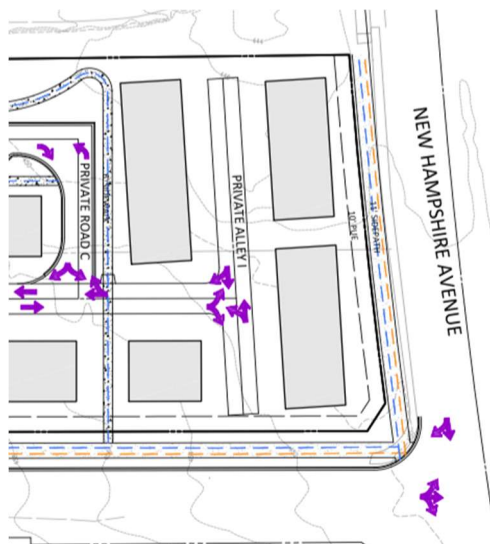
(excerpted from DAIC Plan No. 10.vi. (circulation plan) confirming no vehicular access from site to non-residential road (New Hampshire Avenue))
